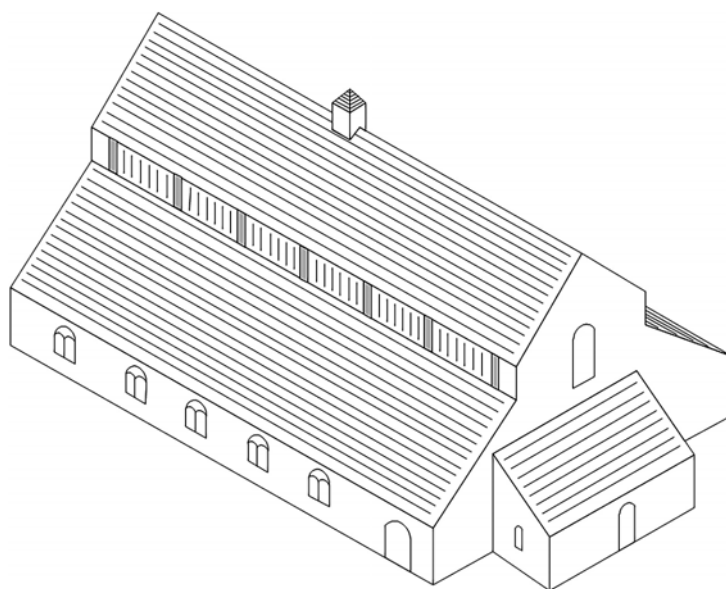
Reconstruction view of the exterior as original, with lean-to service building attached to the north gable. *Drawing N Hill and R Ovens.
